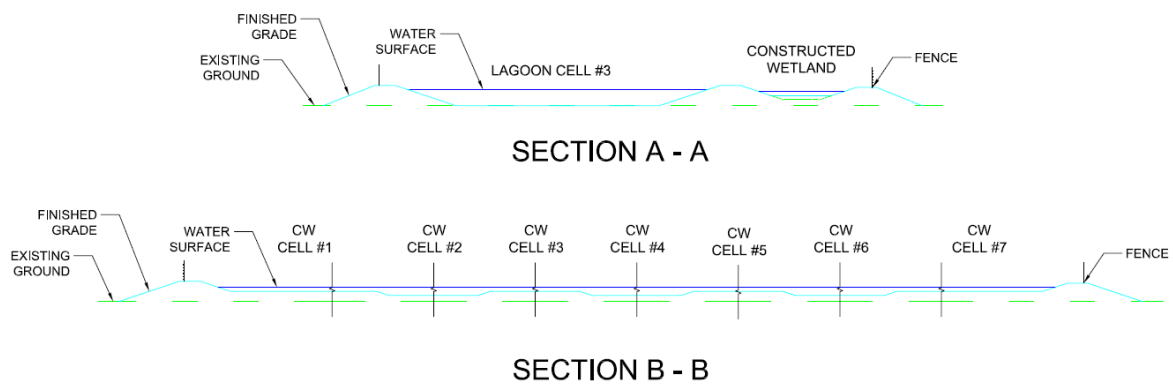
Cross sections of proposed Lagoon Cell #3 and Constructed Wetland.
